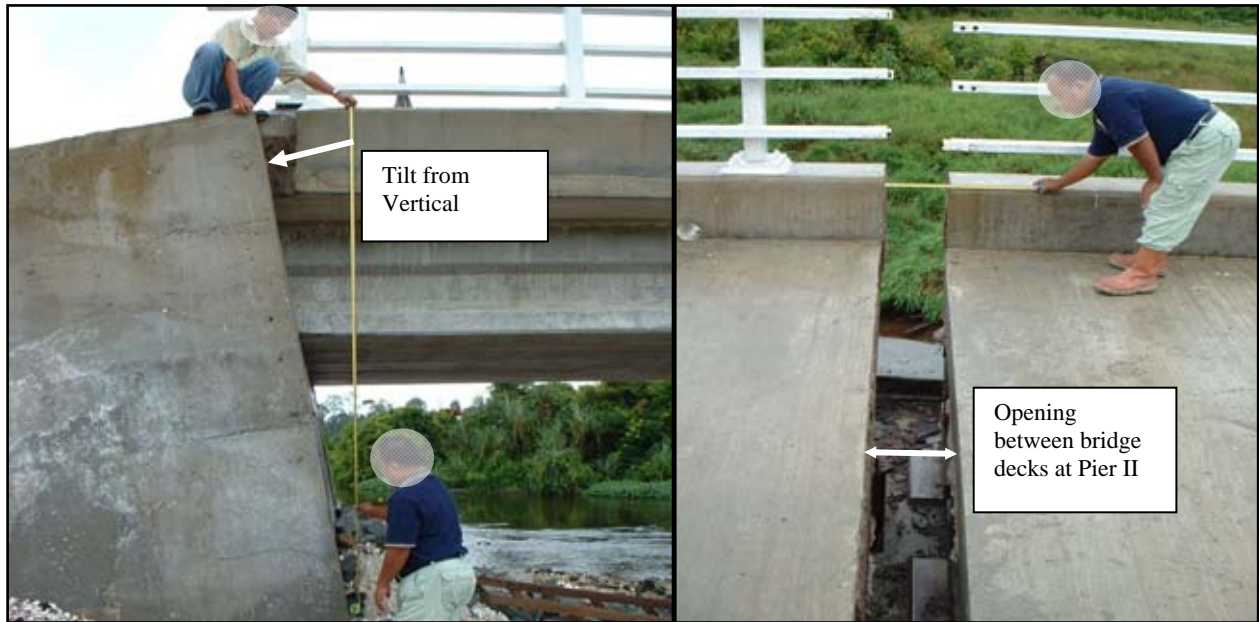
Tilted Abutment and Observed Gap between Bridge Decks (After Gue & Tan, 2003)
